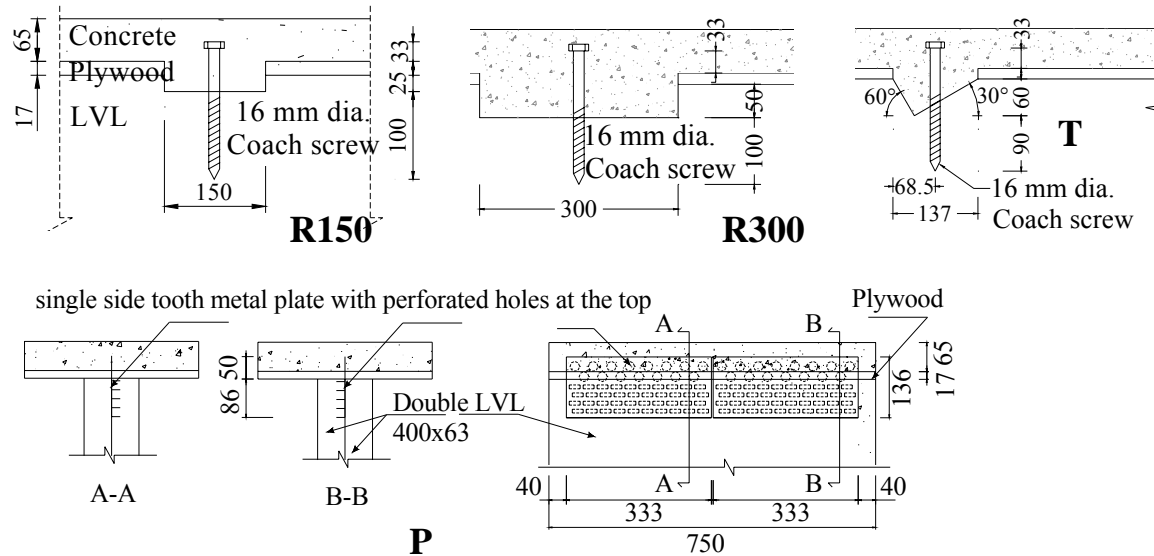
Four types of connectors used to construct the composite beam specimens (dimension in mm)
